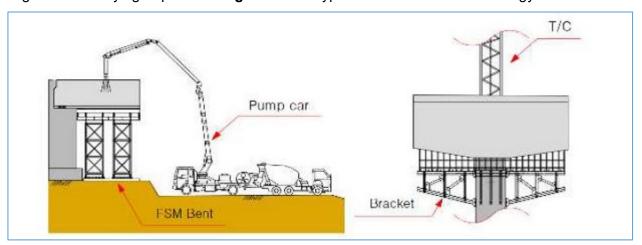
Construction Steps for side span and pier table of the Box Girder Bridge
